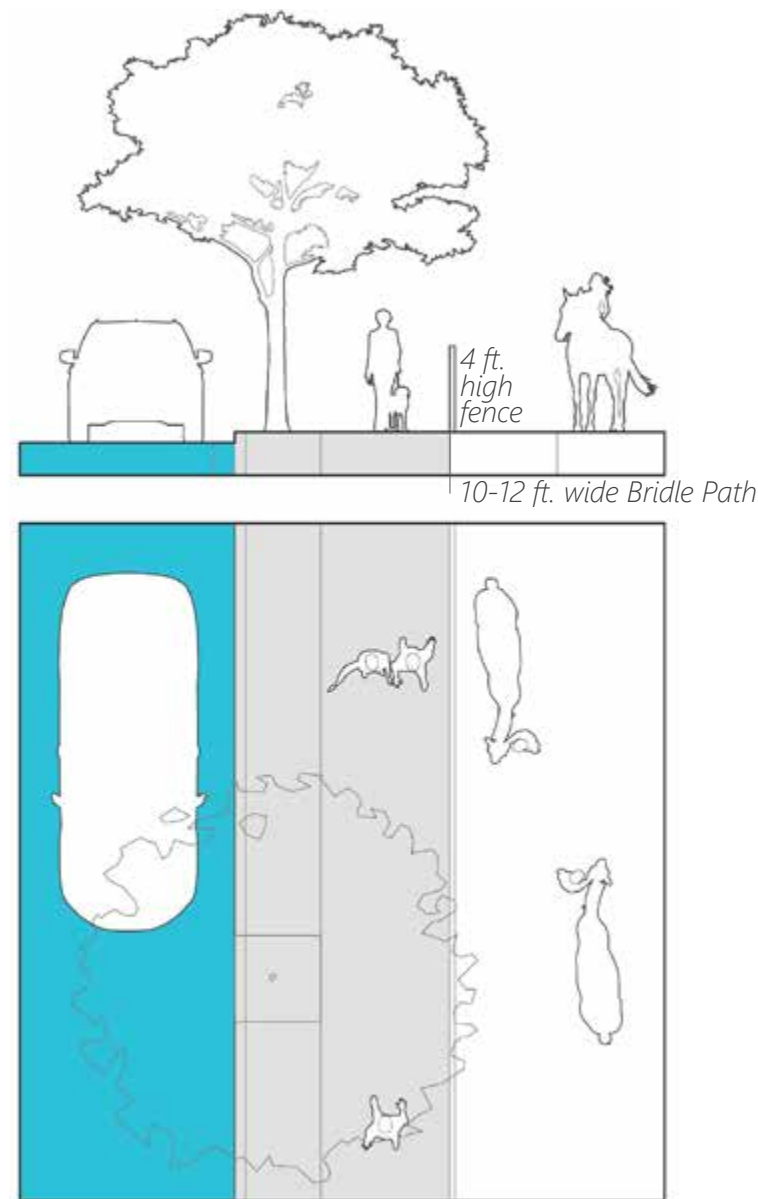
Bridle Path alongside a Sidewalk/Parkway on a Local Street.
